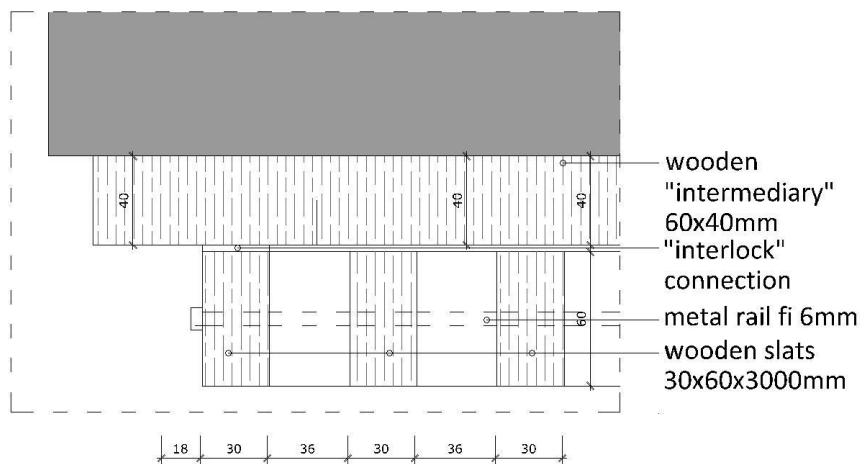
Details and sections of the GDC external wall finishing (wooden slats facade). (source: 4D architects).
